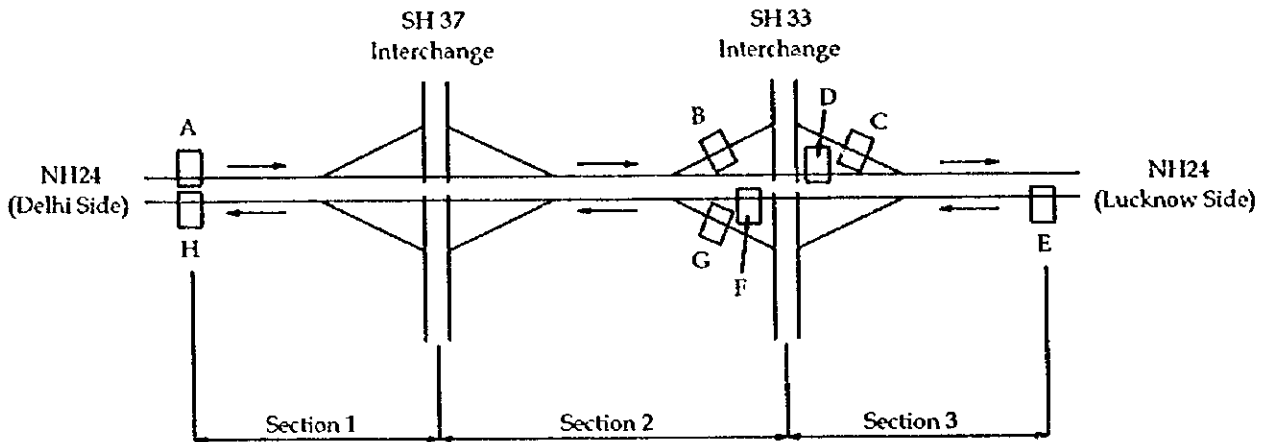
Toll Collection System proposed for Bareilly Bypass
